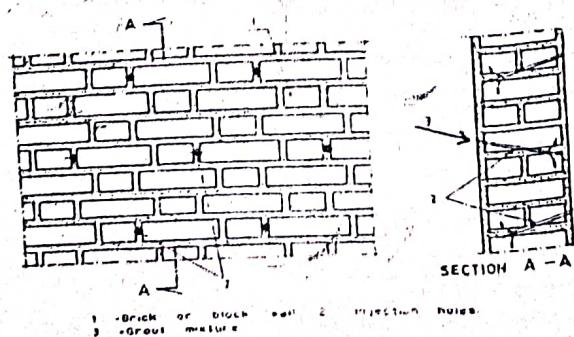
Grout or epoxy injection in existing weak walls (after Bibl. 152)
